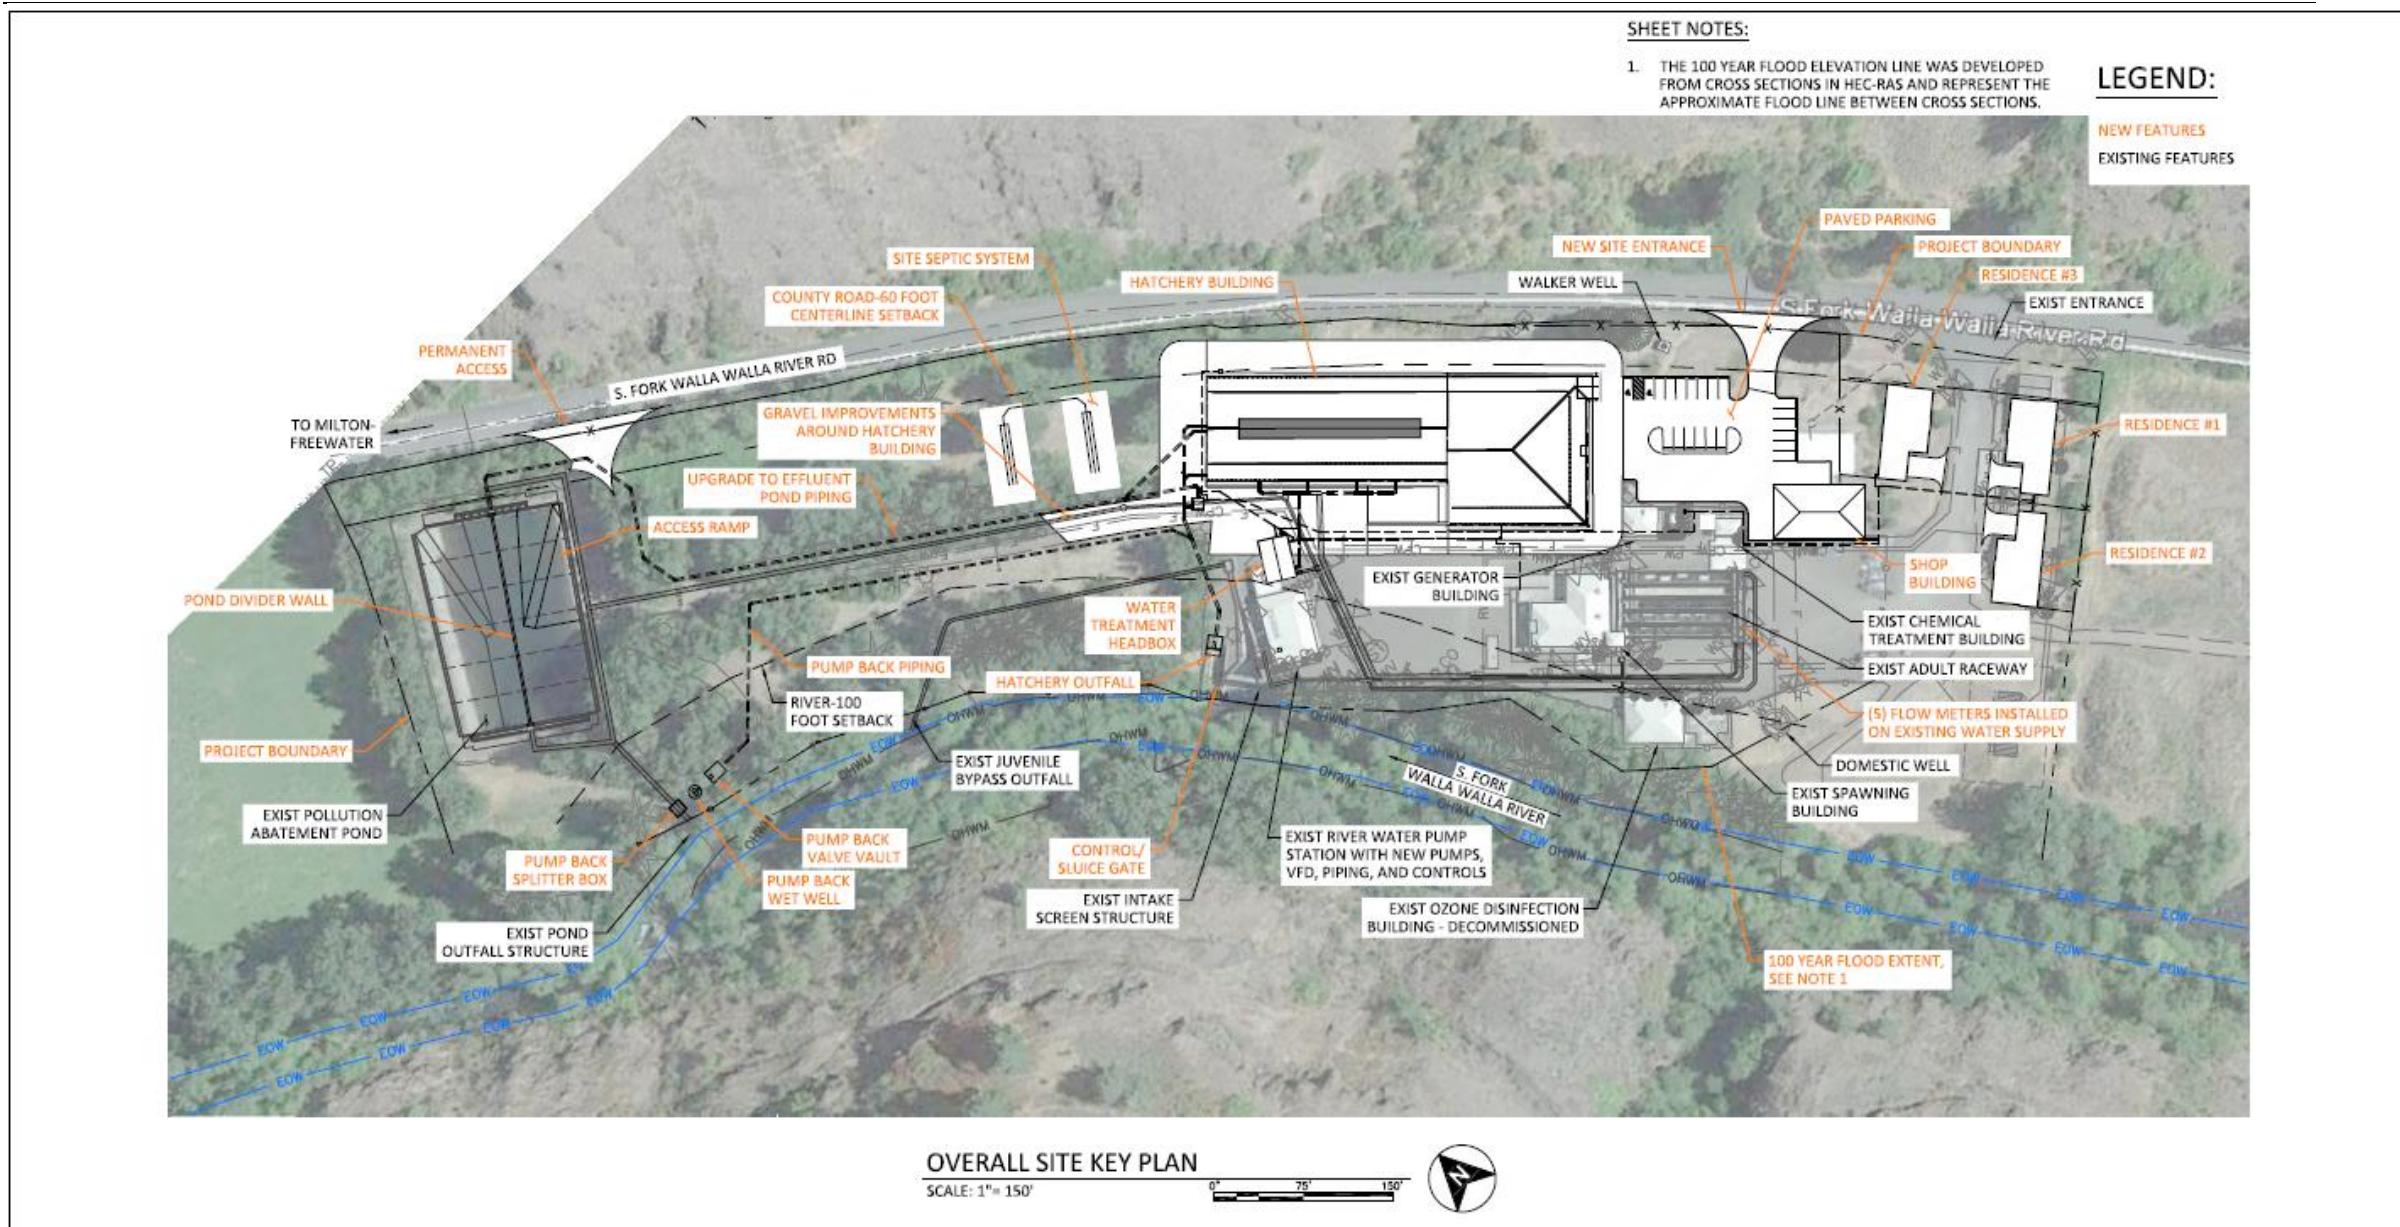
Proposed New Facilities at South Fork Walla Walla Hatchery Site: Alternative 1 (Preferred Alternative)
